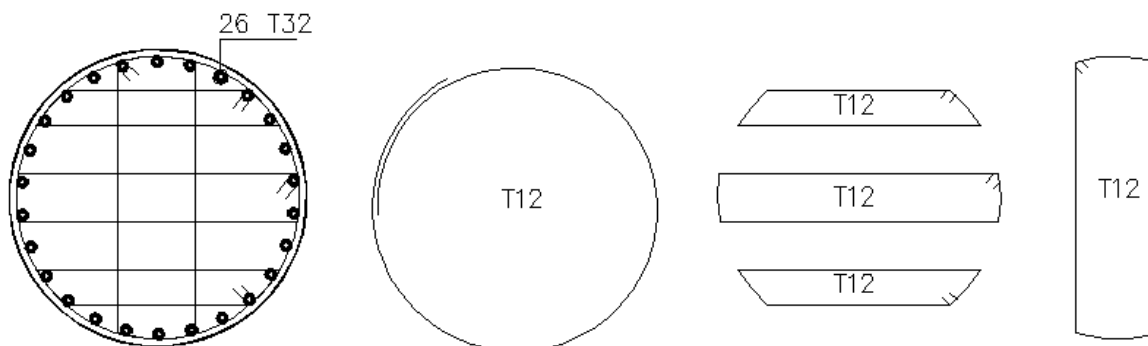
RC Bridge. Reinforcement details of the Pylon's section.
